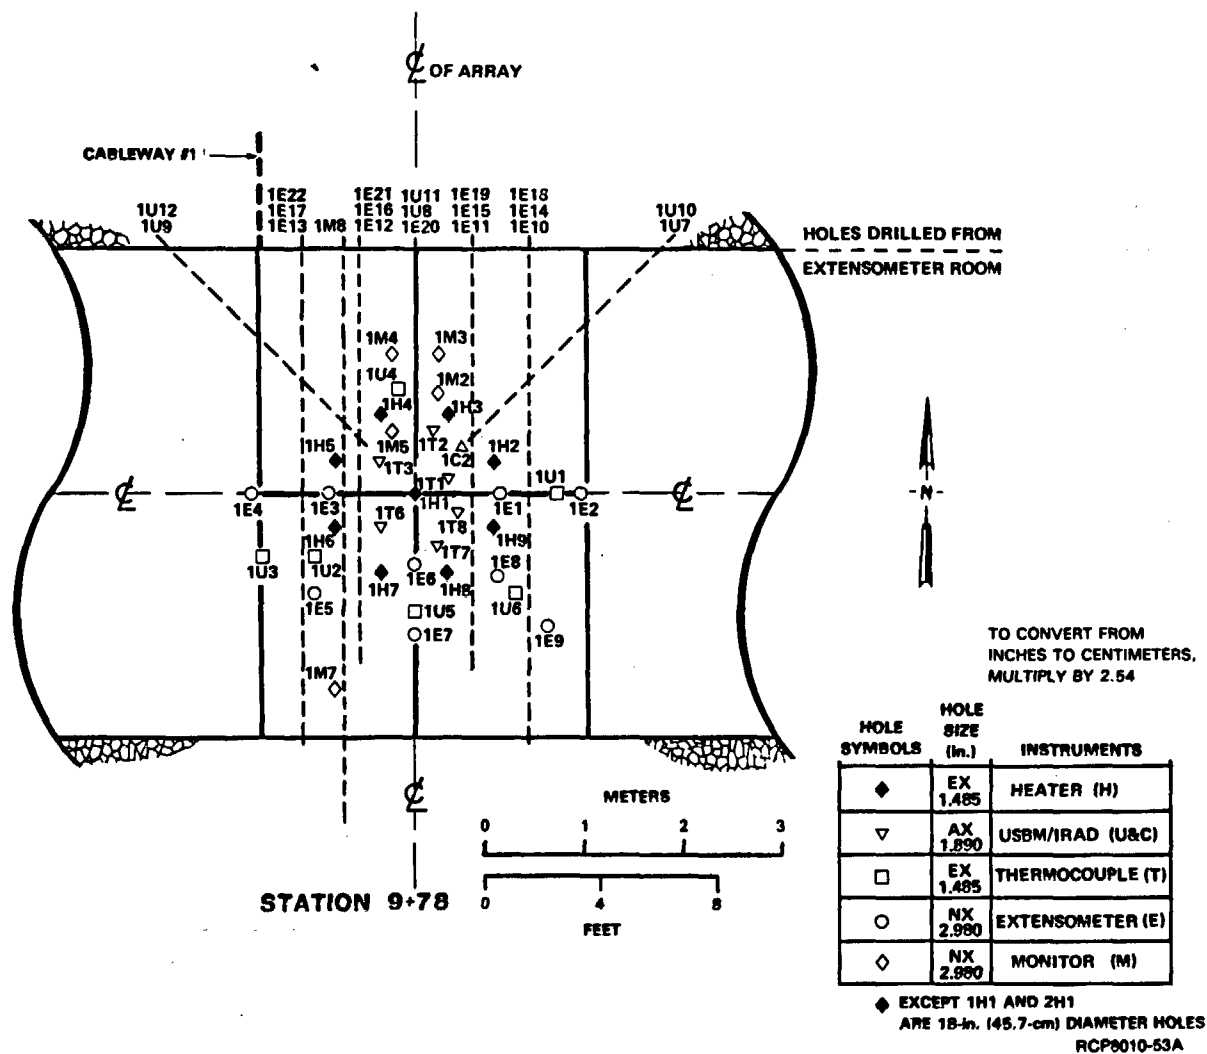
Plan View of Boreholes Drilled for Full-Scale Heater Test No. 1.
